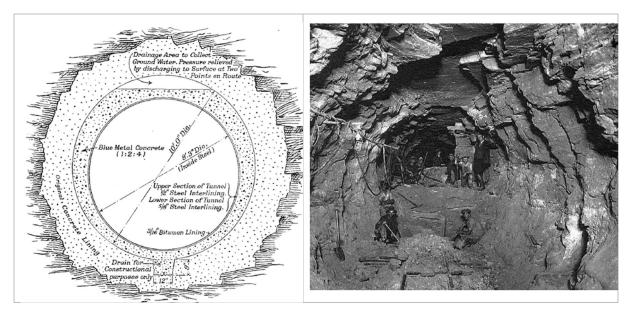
Sydney Water Pressure Tunnel details (G Haskins, 1932)
